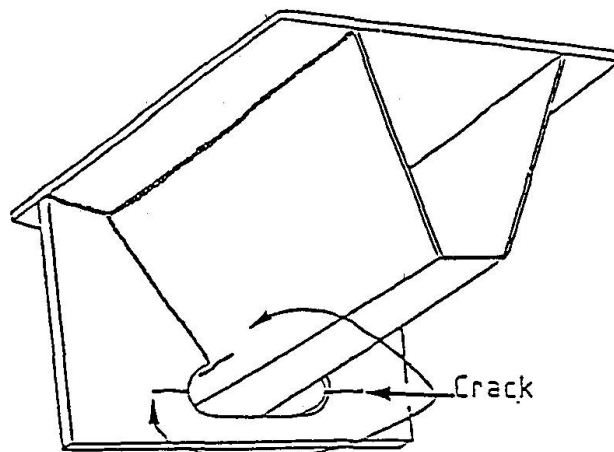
Diaphragm-to-rib connection showing typical crack locations at the cutout
